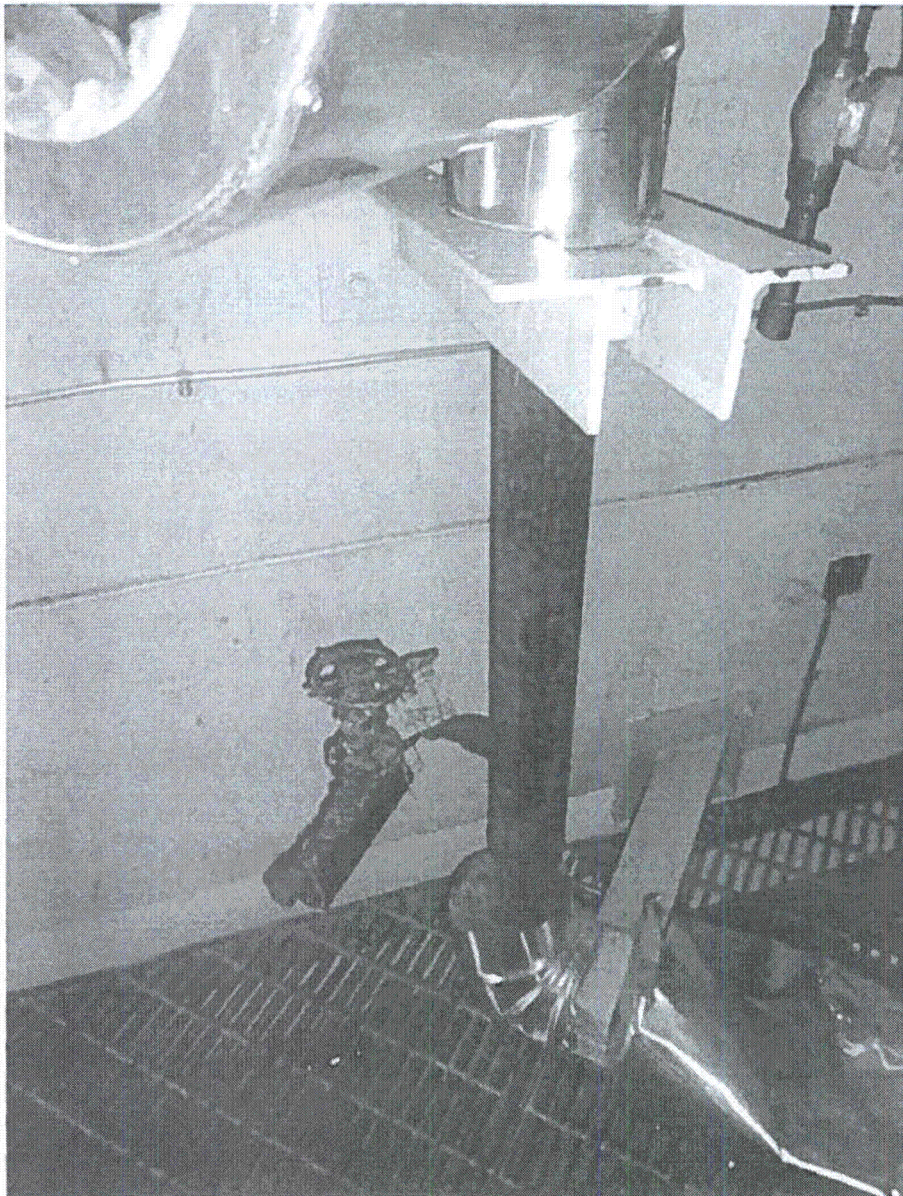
Additional Surface Corrosion on Cooling Water Pipe near Valve Location
